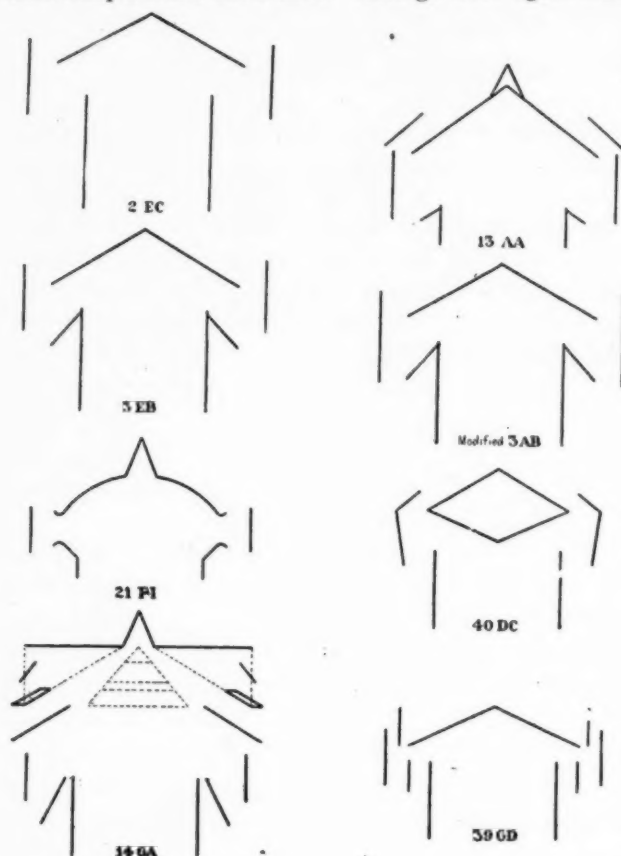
SPECIMEN TYPES OF VENTILATORS TESTED.
